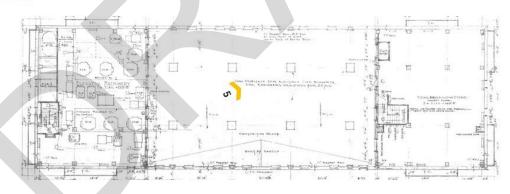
Mechanical Penthouse and Roof Photo Key Plan
